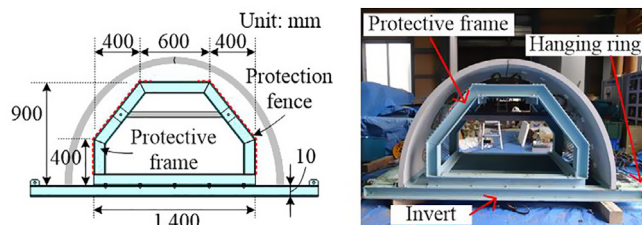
Foundation of culvert and protective basket facilitating measurement.
